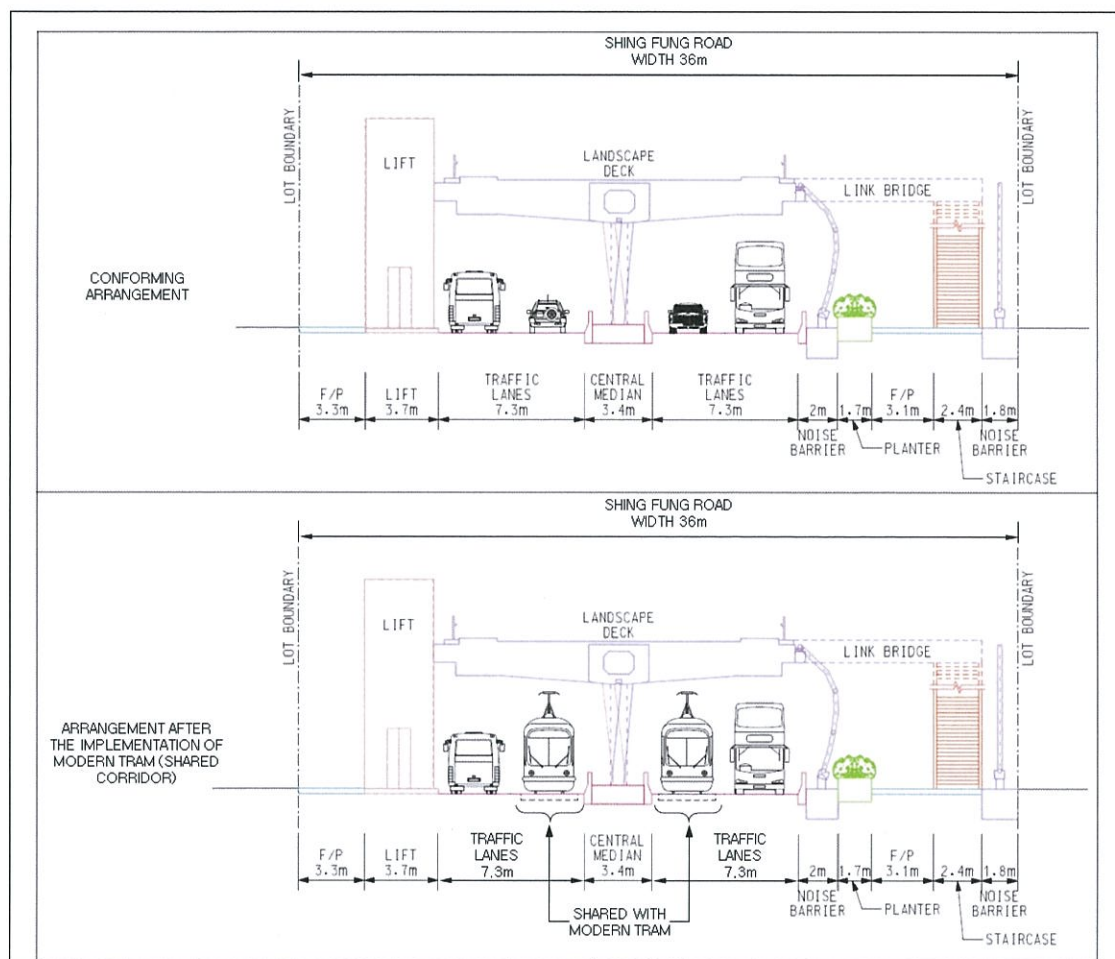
Typical Cross Section Plan of Option 2 (At-Grade Shared Corridor) on Shing Fung Road (Before and After Implementation)
